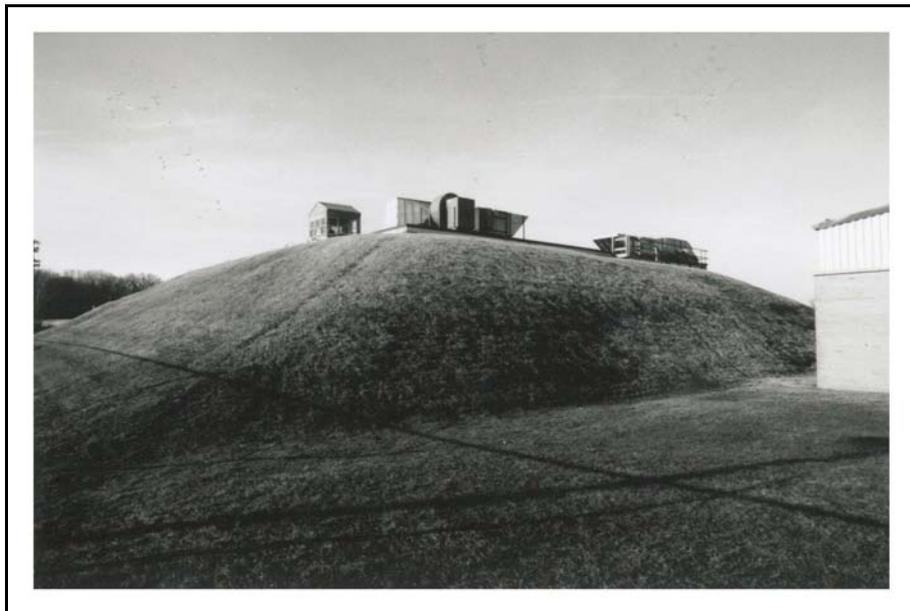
/18: View looking toward north and east facades of Building 301. Facades are sheathed in earth berms, features originally associated with former reservoir.
